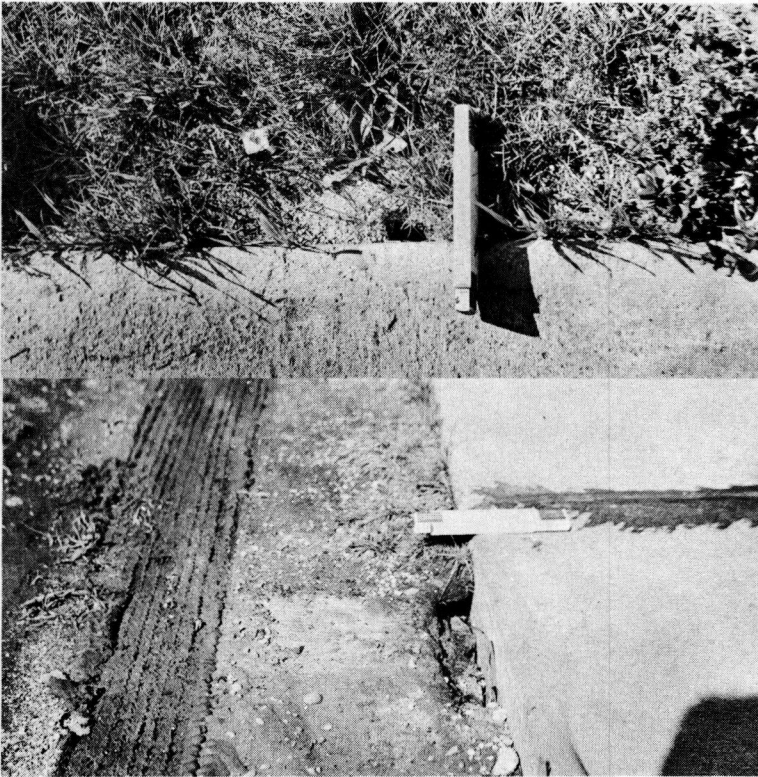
Extrusion of granular material at edge of pavement from dense-graded stone subbases (type II pumping). Reinforced concrete pavement with joint spacing of 40 feet. At top is Station 514+21, 8-inch subbase; bottom is Station 523+00, 5-inch subbase.
